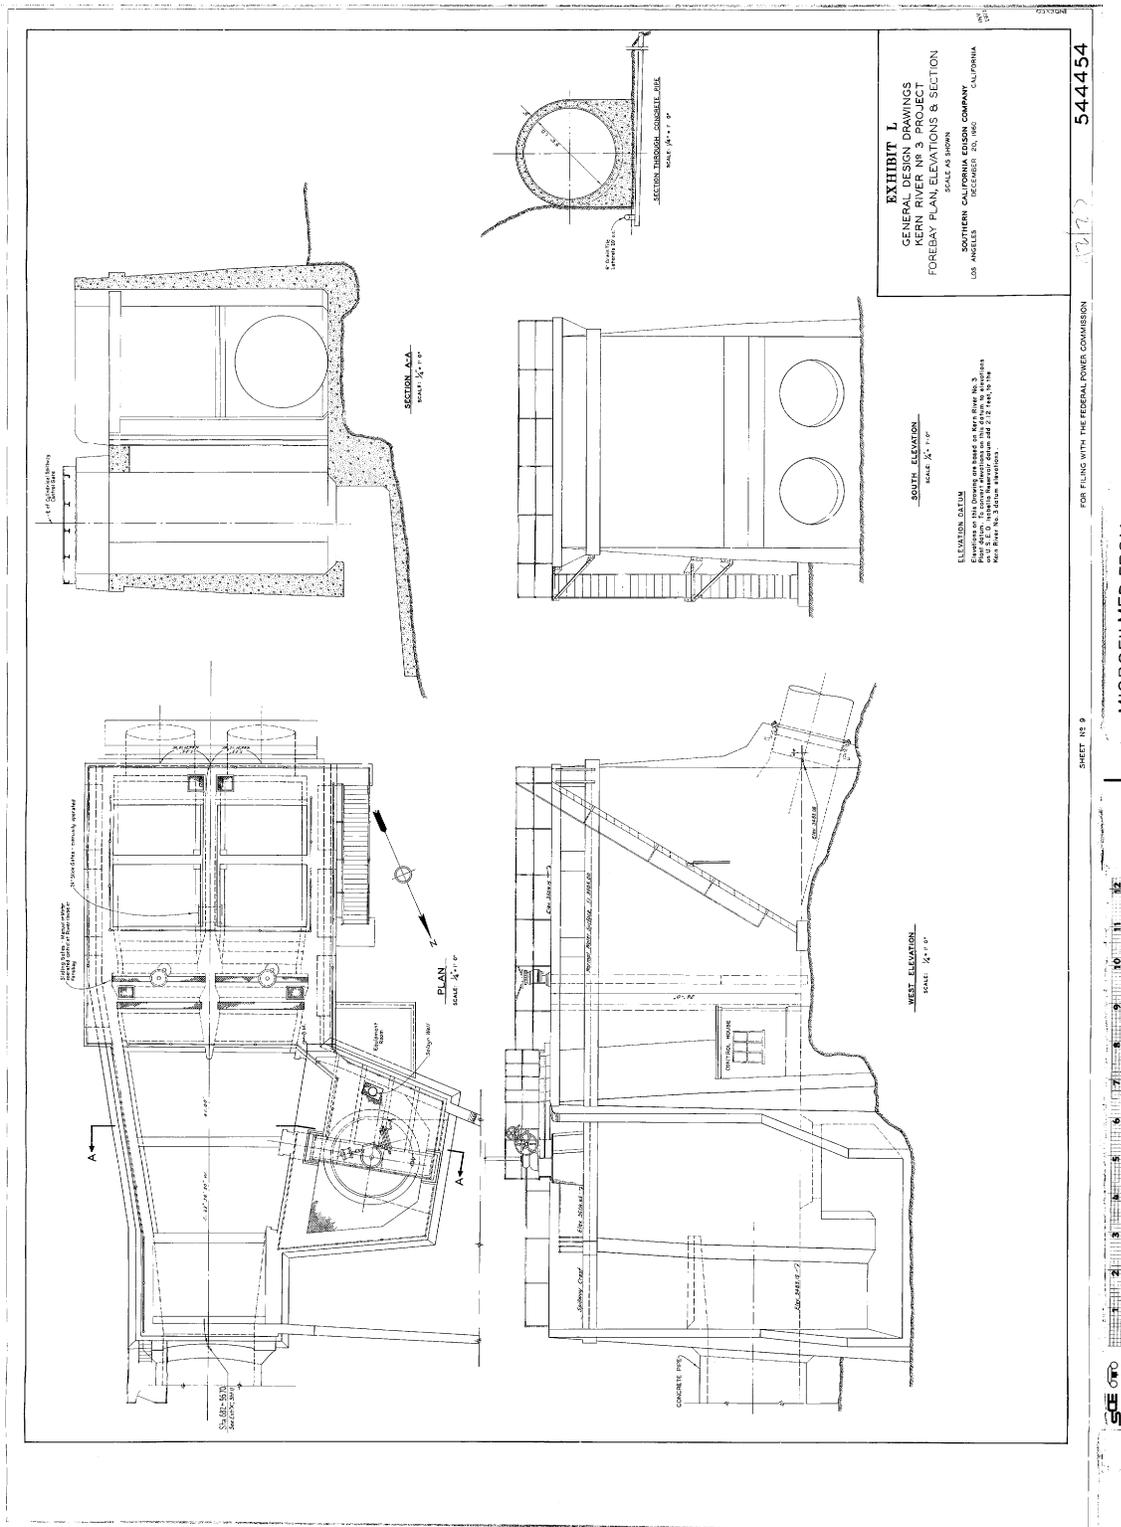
“Exhibit L, General Design Drawings, Kern River No. 3 Project, Forebay Plan, Elevations & Section.” 1960. Drawing #544454.
